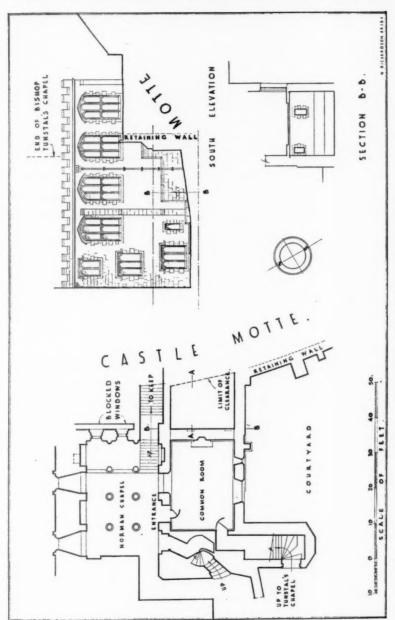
Plan and Elevation of Bishop Tunstal's Chapel.
